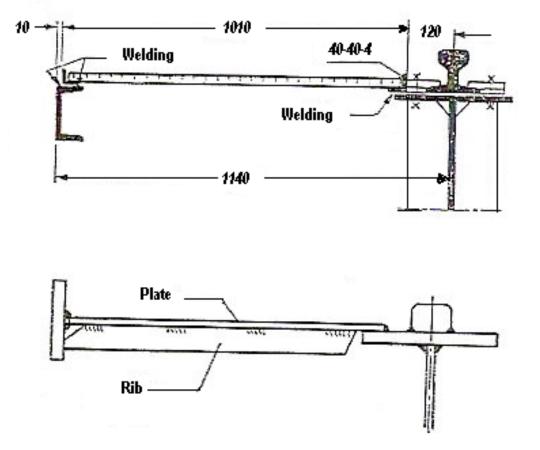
Examples of a runway beams braced horizontally by a plate
